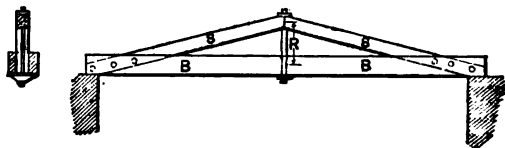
Trussed Wooden Girder. One Vertical Tie
